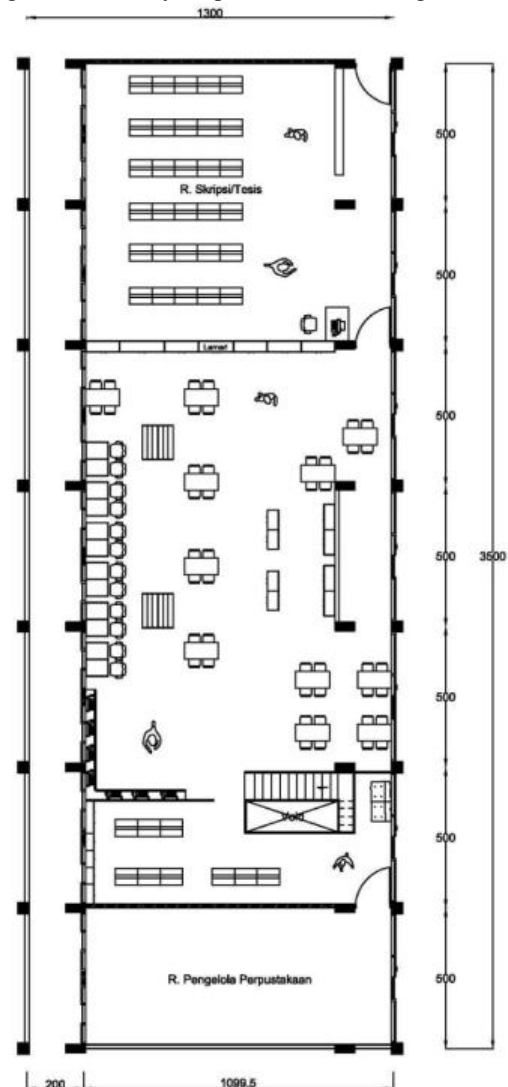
Floor Plan of the 3rd floor of the Budi Luhur University
